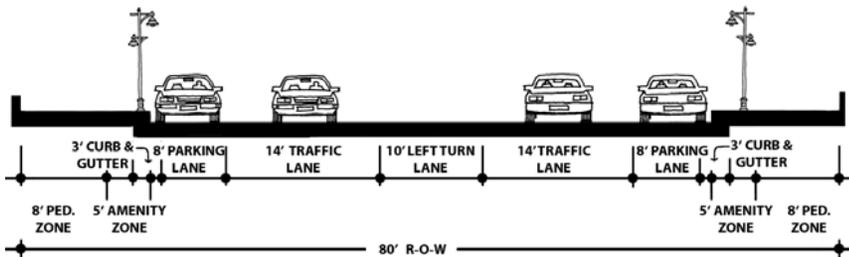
DOUGLAS CORRIDOR DISTRICT STREET SECTIONS (WITHOUT STREETScape)
